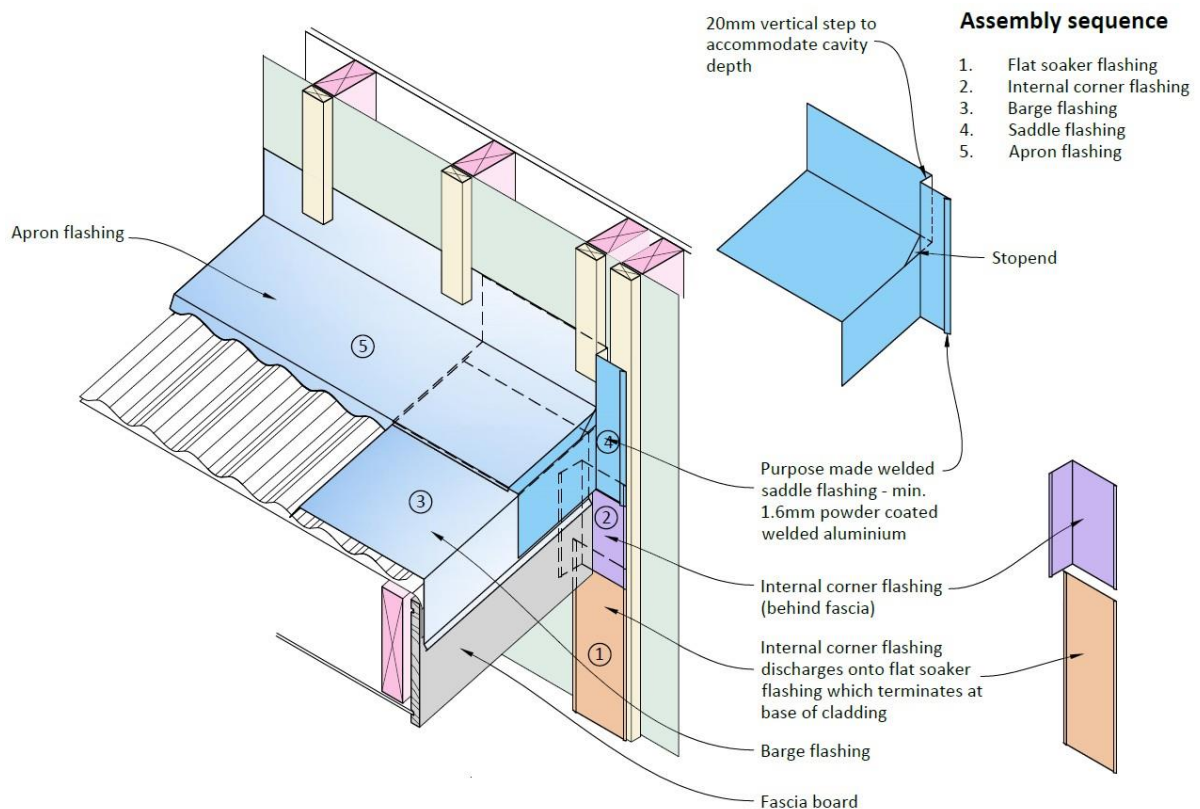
Example of 3D Junction - Barge Flashing to Wall
